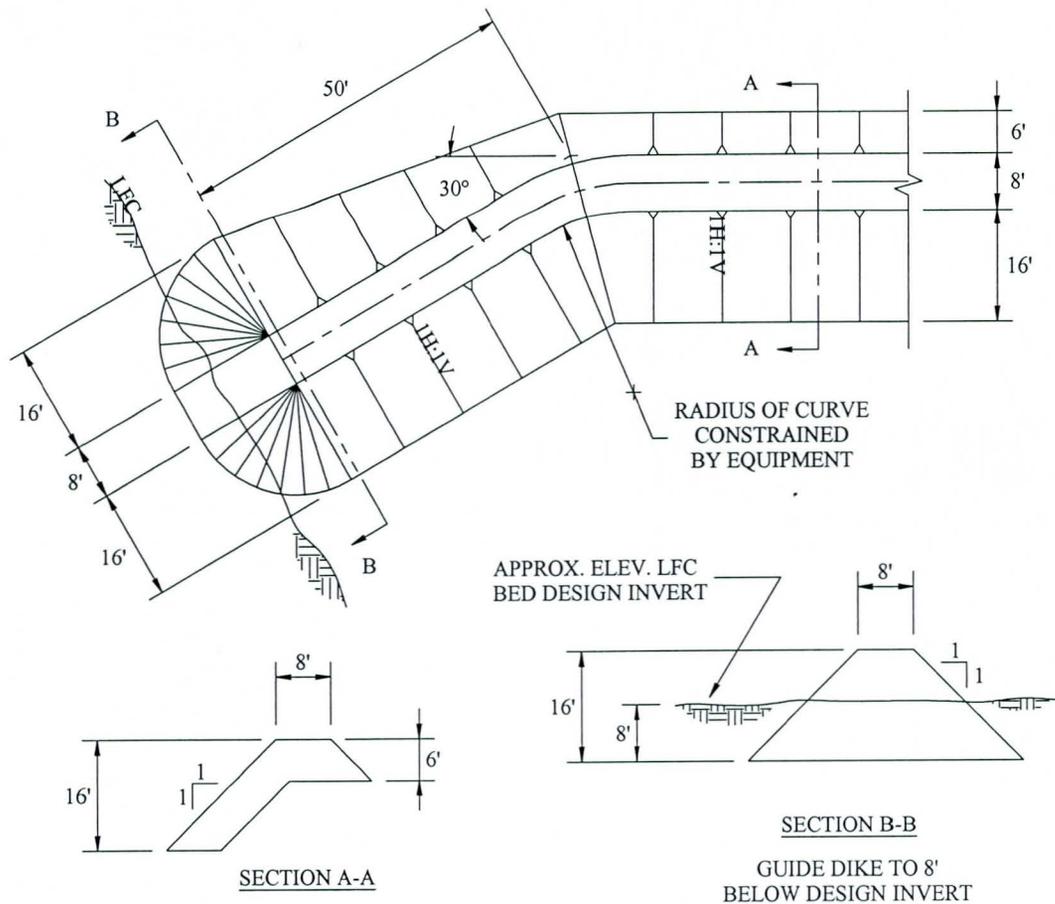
Plan view of revised guide dike design, end detail for low flow channel side.
